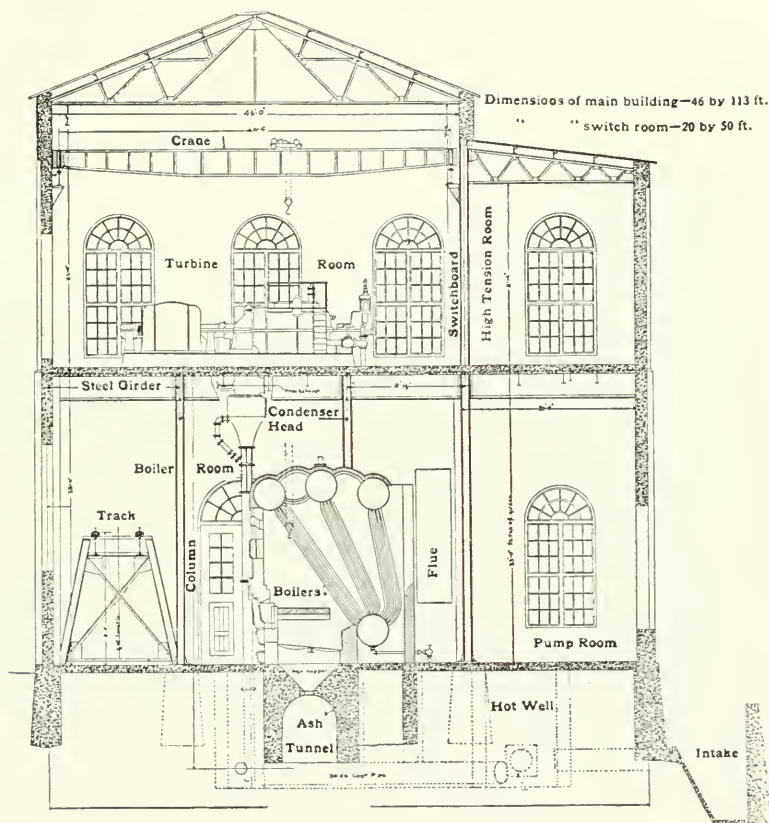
SECTIONAL ELEVATION OF WEST POINT STATION
